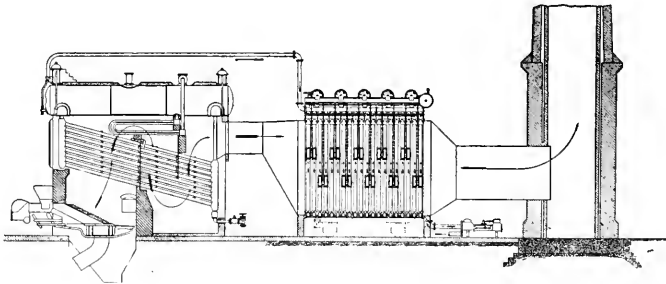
CROSS-SECTION OF A TYPICAL BOILER PLANT SHOWING INSTALLATION OF AN ECONOMIZER
